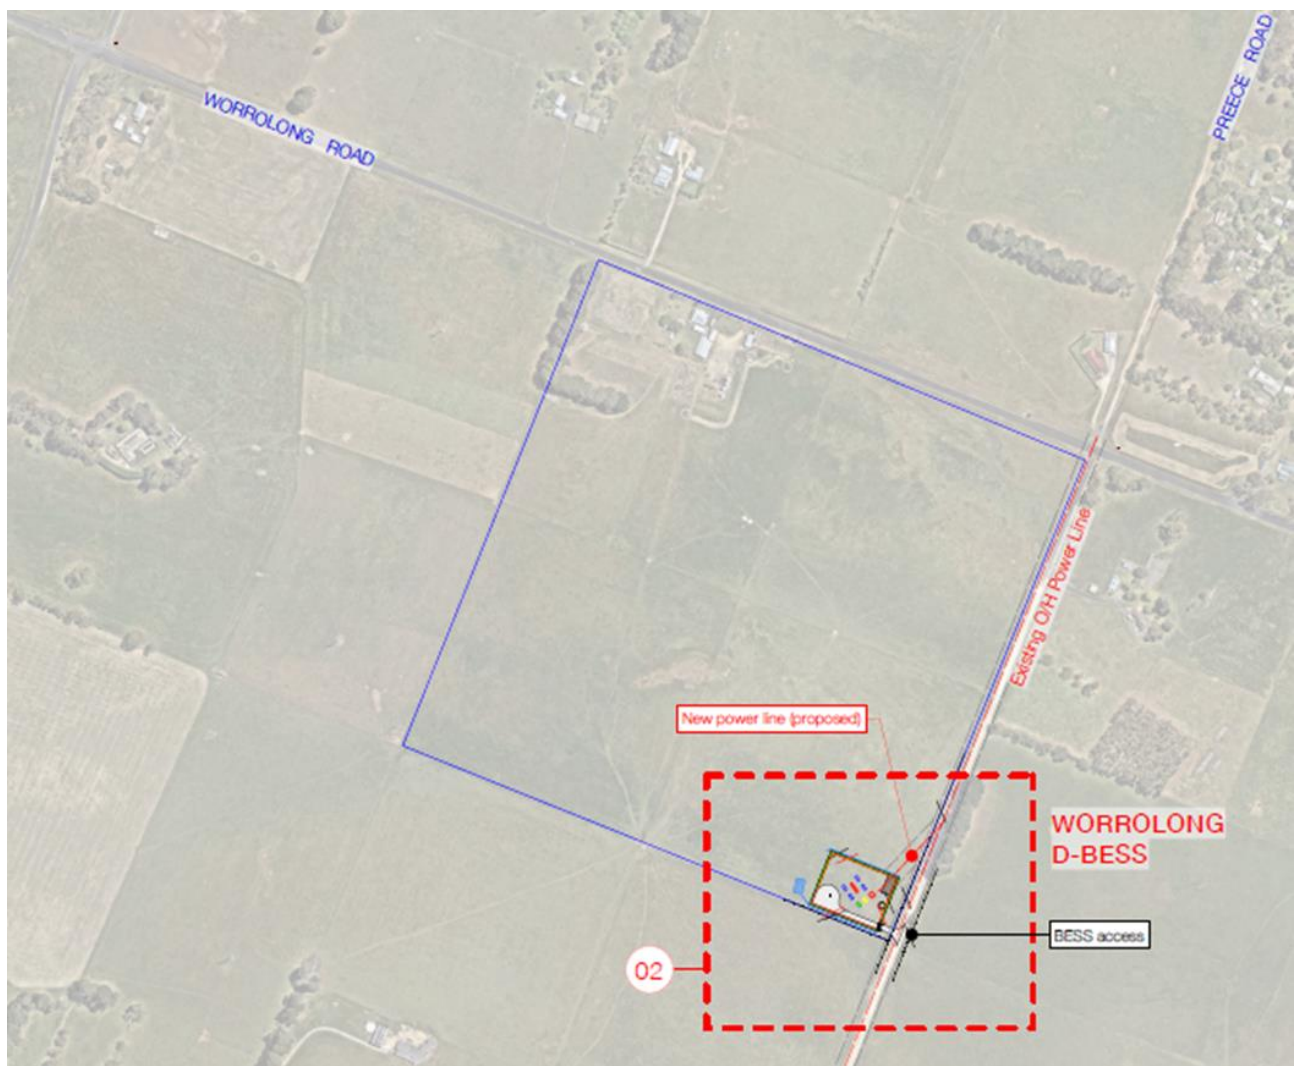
Overview/context plan plan with the REF in the southeastern corner of the allotment
